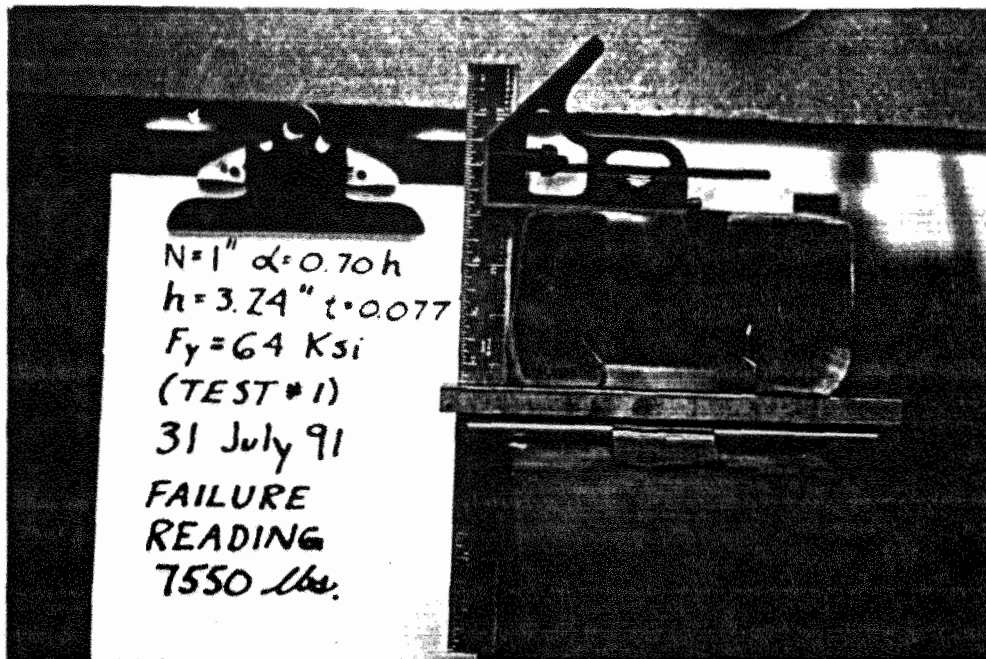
Typical Web Crippling Failure, Specimen EOF-SU-10-4(#1)
